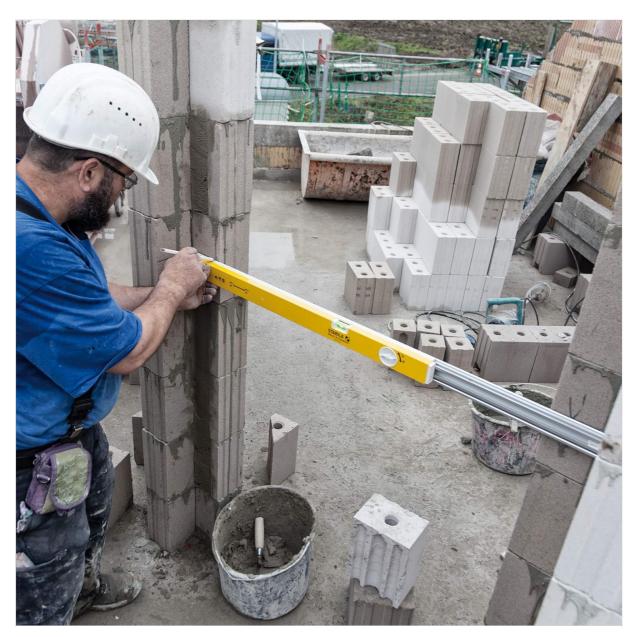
A construction worker using the Stabila extendable level to verify the vertical alignment of a concrete block wall.
